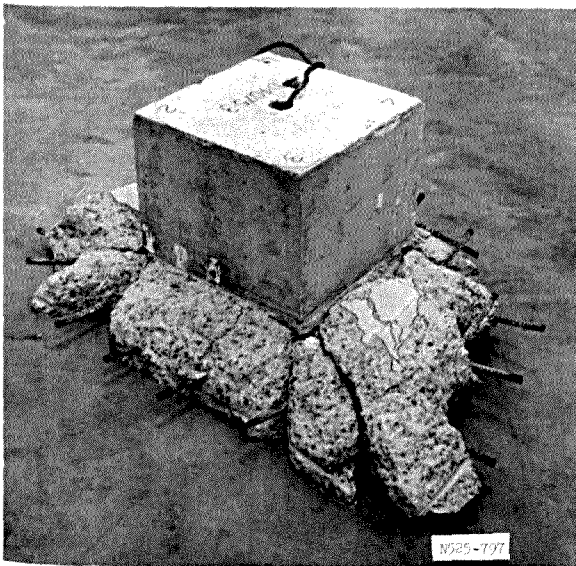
Posttest photographs of Specimen D4075-3 (Sheet 1 of 2).
